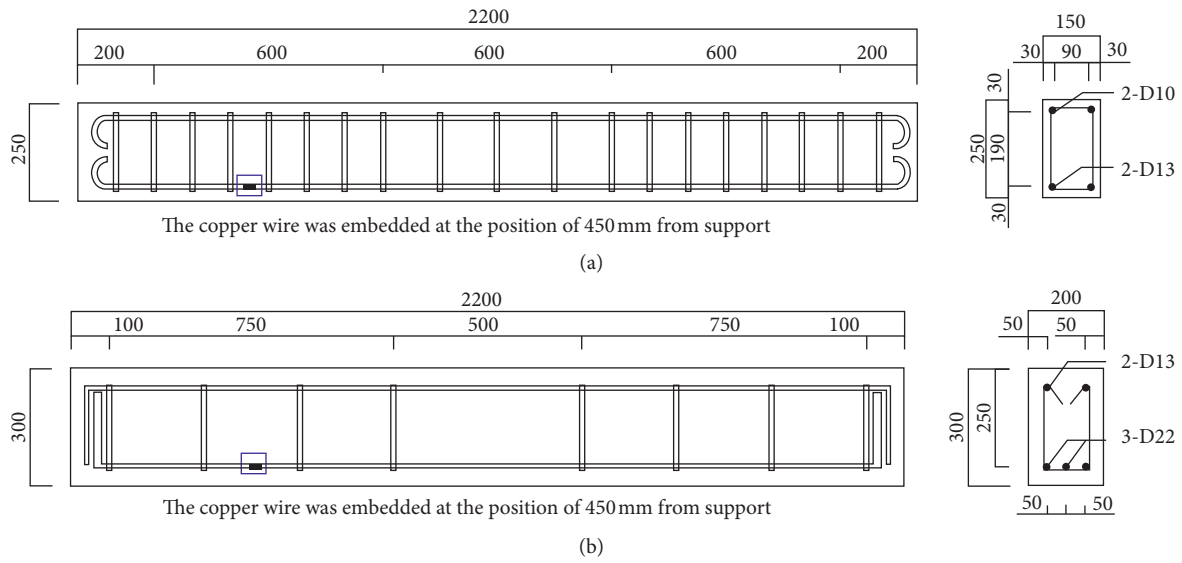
Reinforcement details of beams: (a) flexural failure type beam and (b) shear failure type beam.
